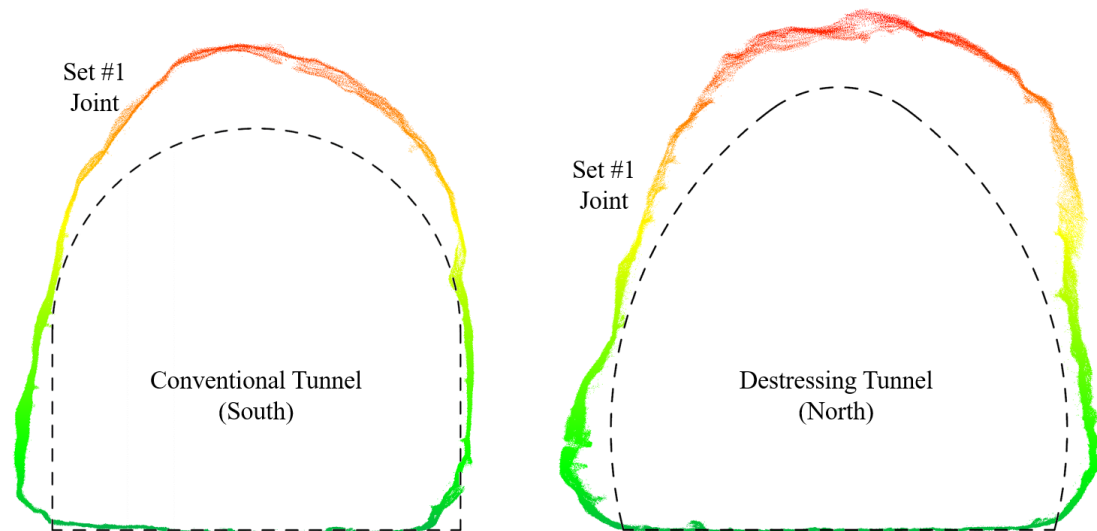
South and north tunnel cross sections of scan data at 14.0m chainage.
